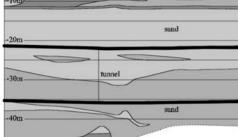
Geotechnical profile GHT tunnel in polder. Tunnel is drilled from right to left in this picture.
